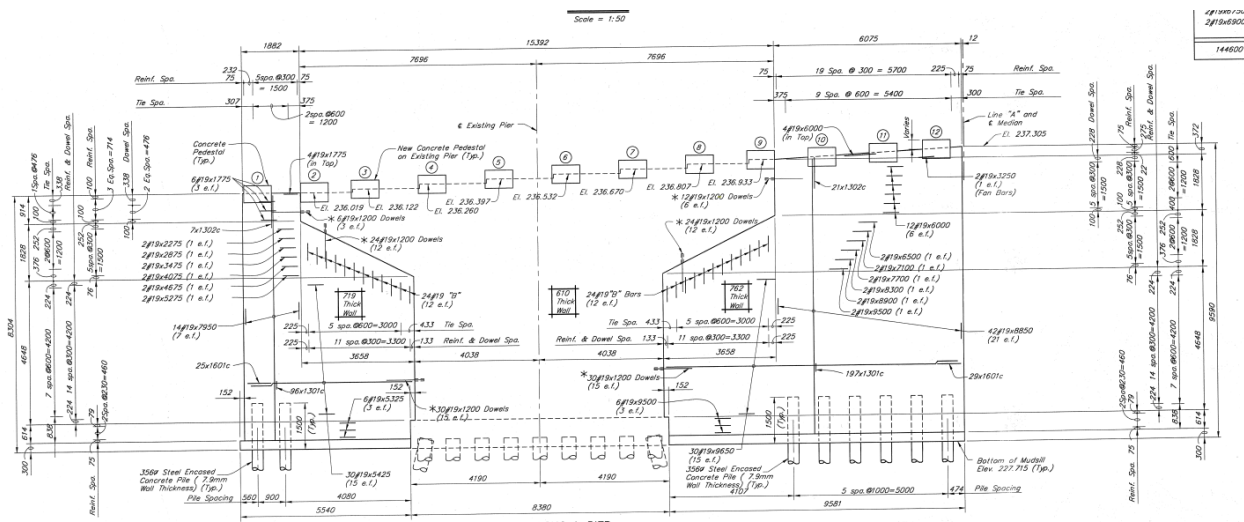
Transverse Elevation of Interior Pier (NBI 36890) (2001)
